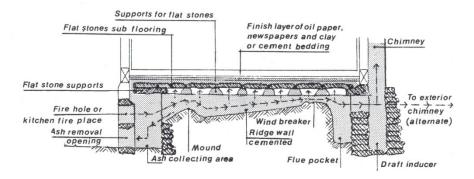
Schematic section of floor heating system, called *ondol*(S. Y. Park 1992)
